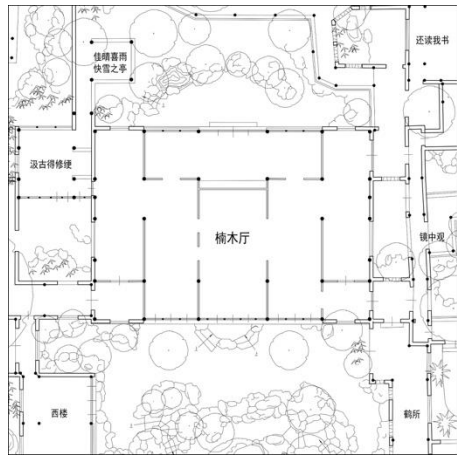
1930s' floor plan of the Celestial Hall of Five Peaks, Lingering Garden, Suzhou. [1]
